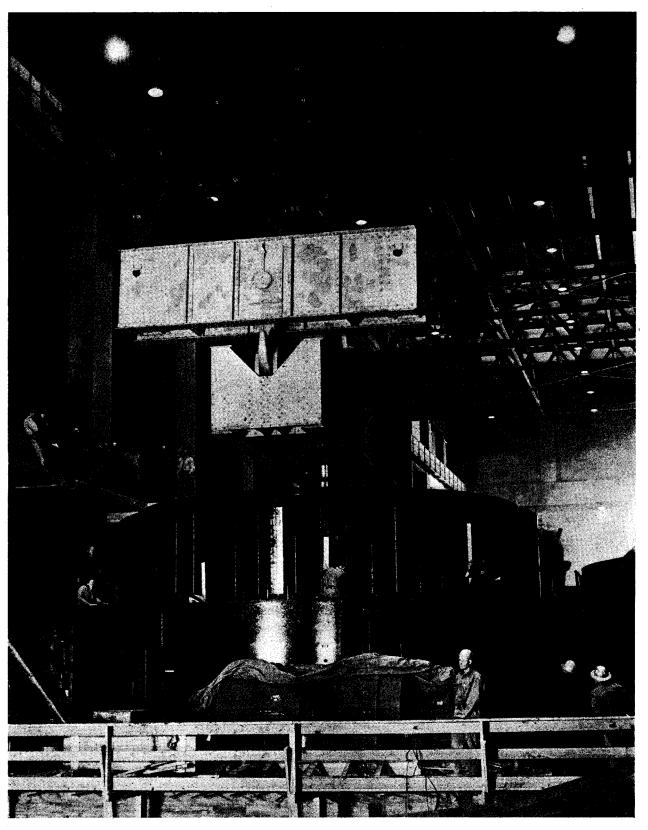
Power House View Showing a Large Rotor Being Lowered to its Final Position in the Stator.
